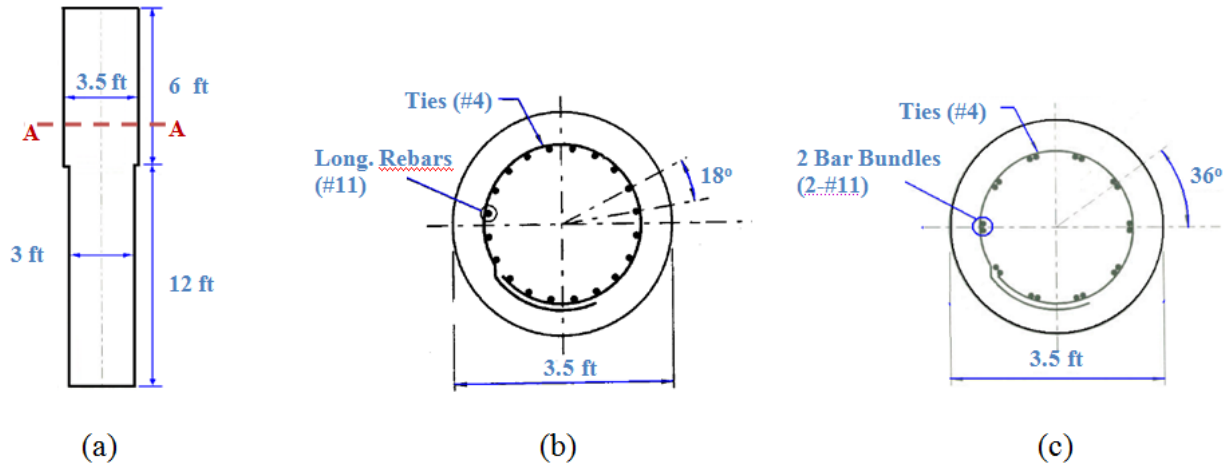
Schematic of caissons, elevation view. (b) Original and (c) Revised longitudinal reinforcement configurations, Section A-A.
